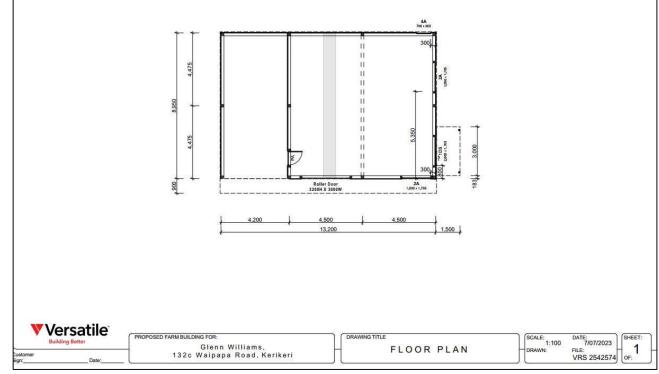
Excerpt of Supplied Development Drawings showing Proposed Floor Plans for Shed.
